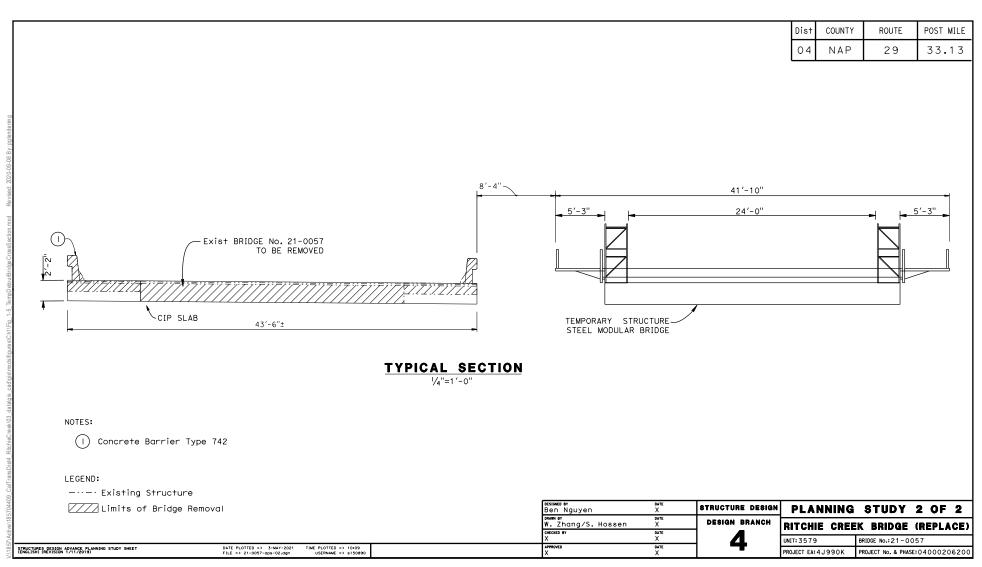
Temporary Detour Bridge Cross-Section Ritchie Creek Bridge Replacement Project
